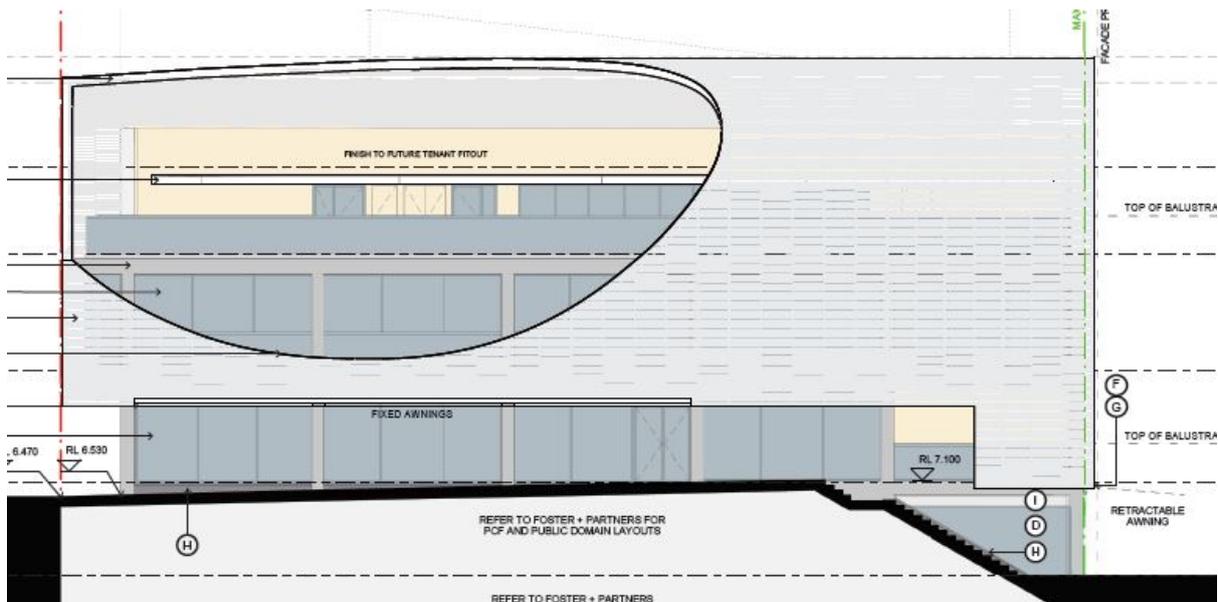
South elevation (from future public plaza), commercial building on former Jacksons on George site.
